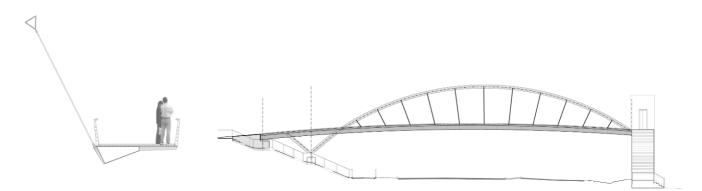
Sant Fruitos Footbridge. Typical cross-section and elevation.
